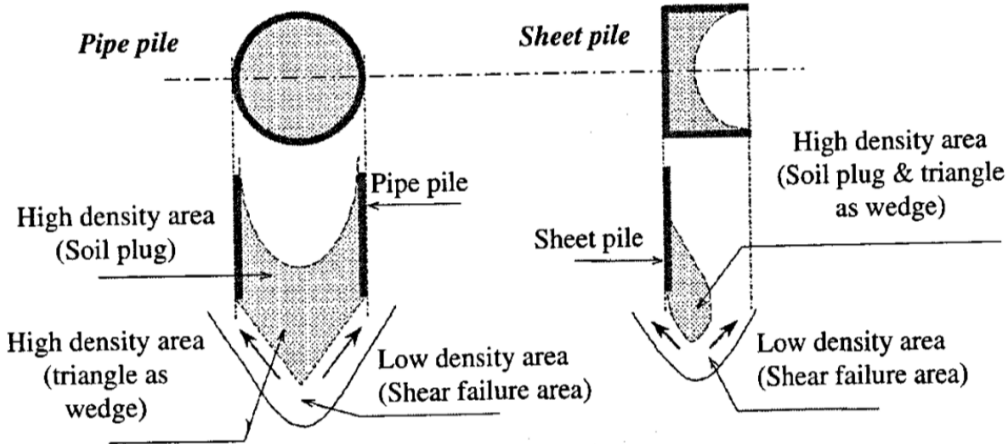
Model images of tip area of Model piles E (box pile) and F (sheet pile) (adapted from Taenaka et al. 2006)
